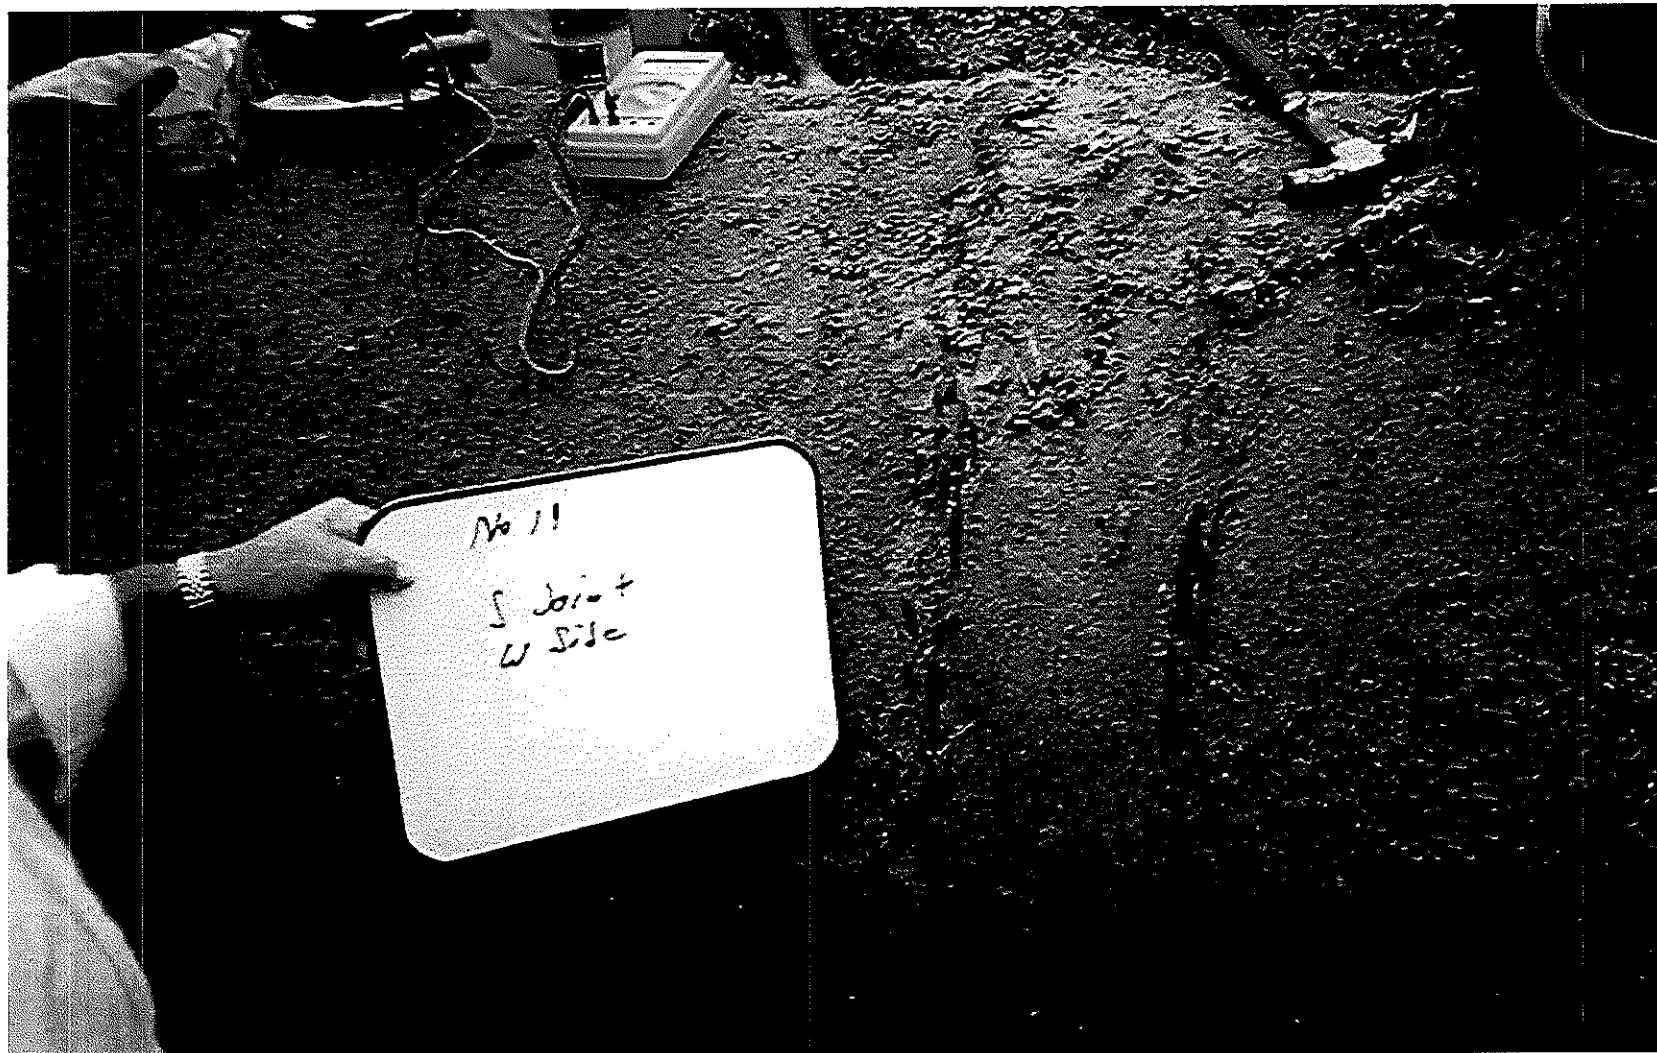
Excavation 10 - Pipe Joint Deteriorated.
